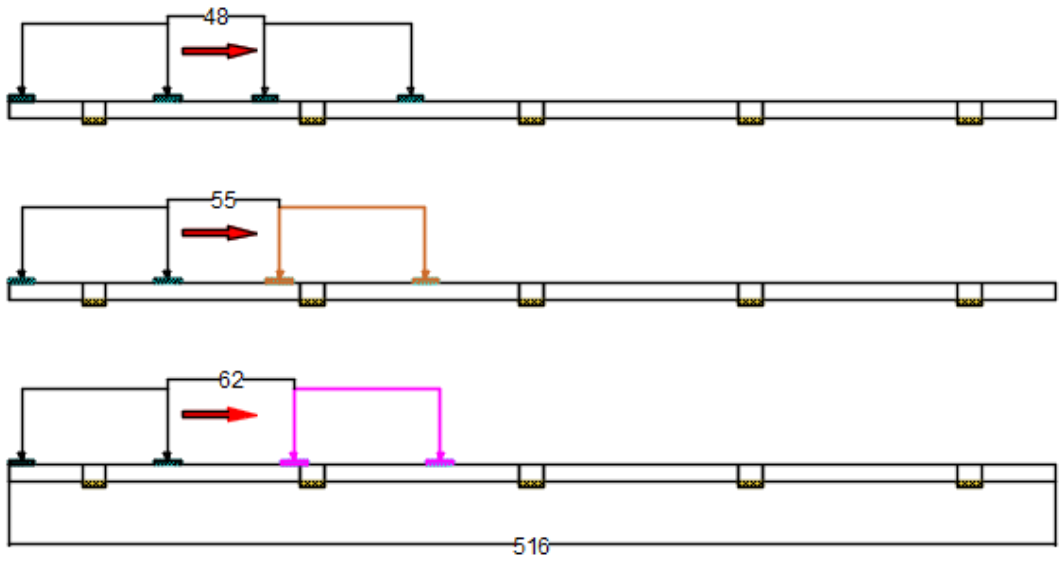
The placement of two HL-93 truck load on the deck slab with 9 ft girder spacing (first three combinations of Case 2, unit: in)
